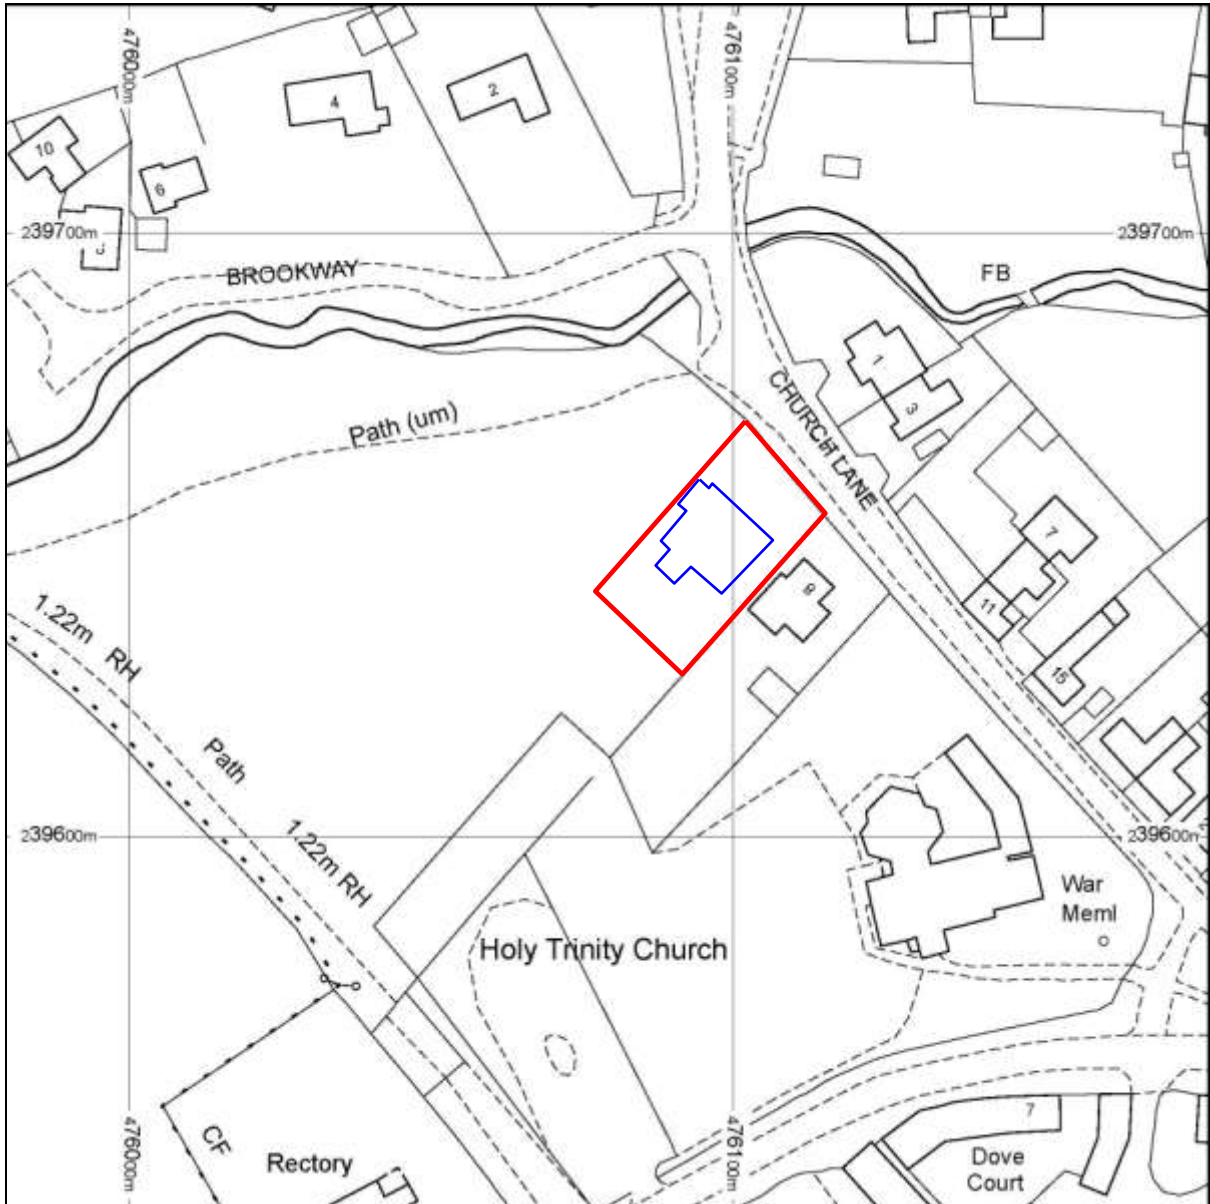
Site plan with approx. footprint of the new building outlined in blue (Scale 1:1250)
